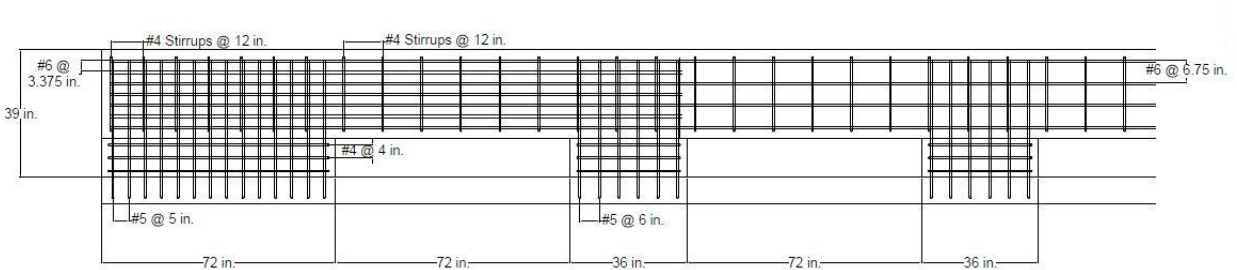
New Open Concrete Bridge Rail End and Interior Section, Elevation View
